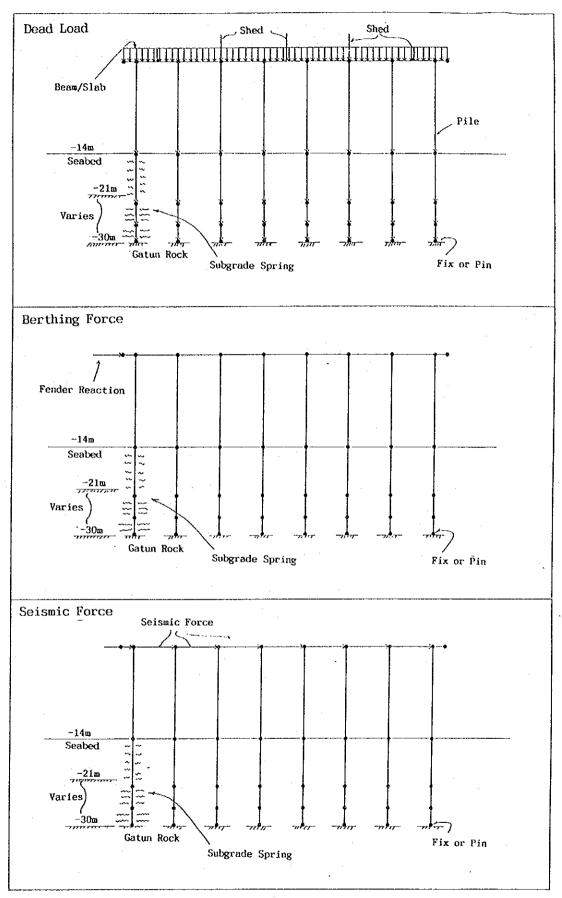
(a) Basic Loading Case : Pier No. 6
